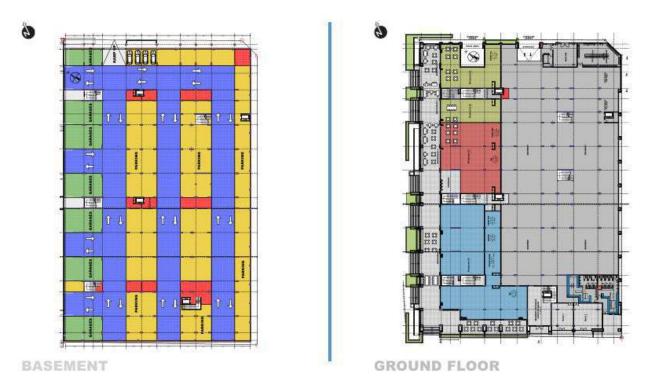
BASEMENT AND GROUND FLOOR PARKING SPACES
